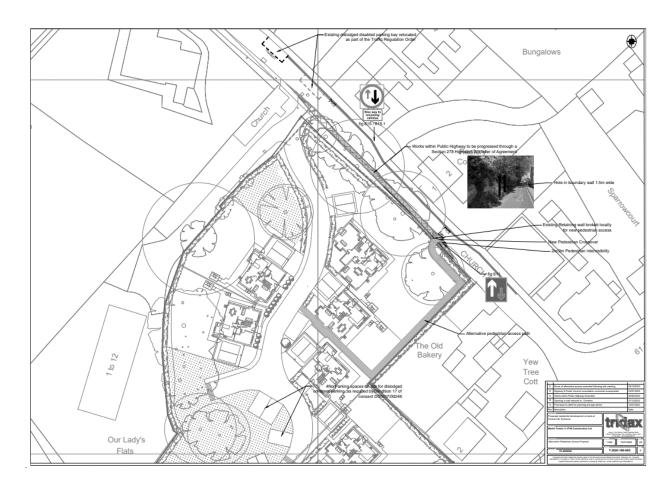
Part site plan, showing off site highway works -revised scheme (not to scale)
